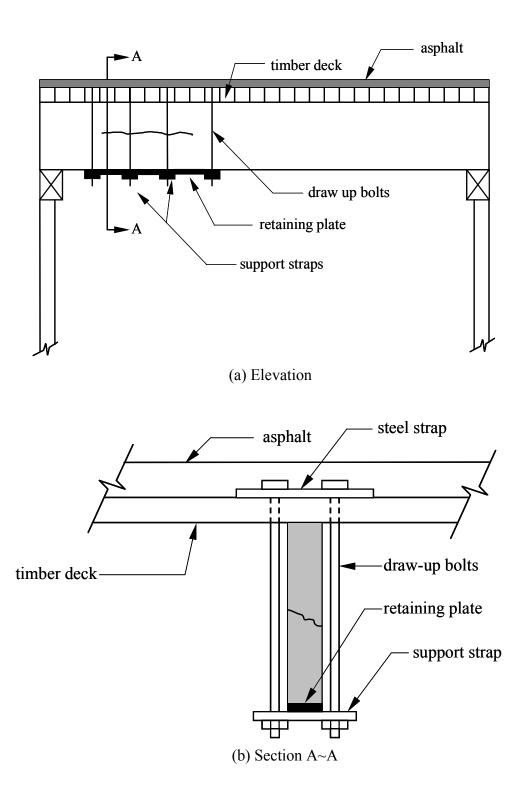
Repair of Cracked or Damaged Timber Stringers.
